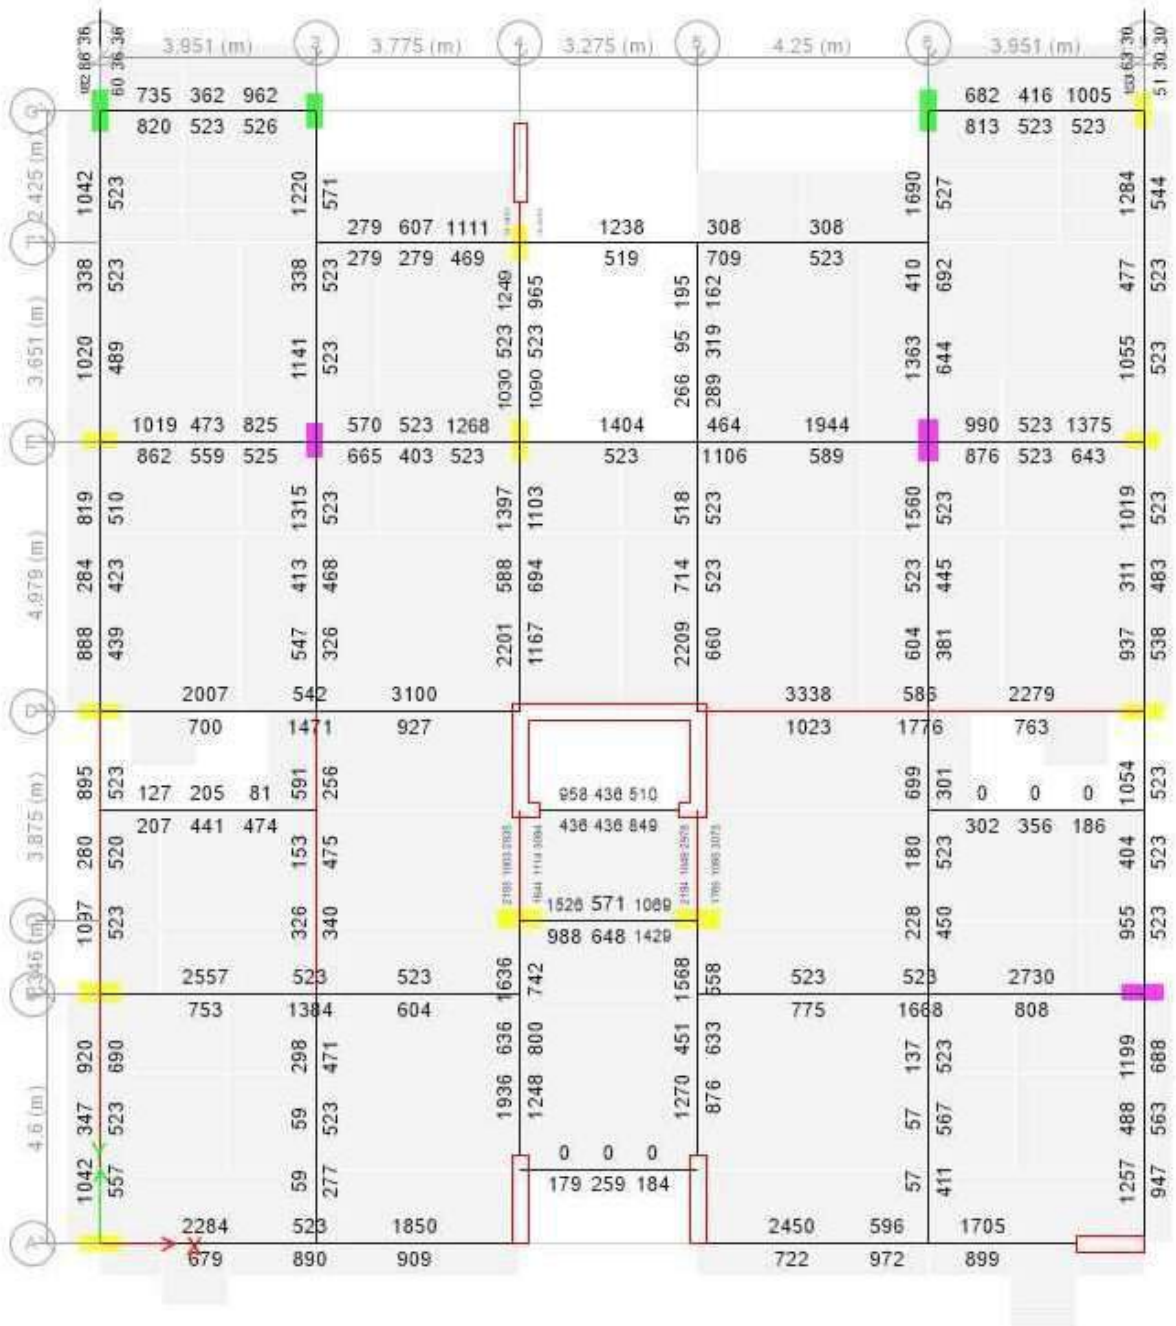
Reinforcement of 3rd & 4th Floor Beam (mm²)
